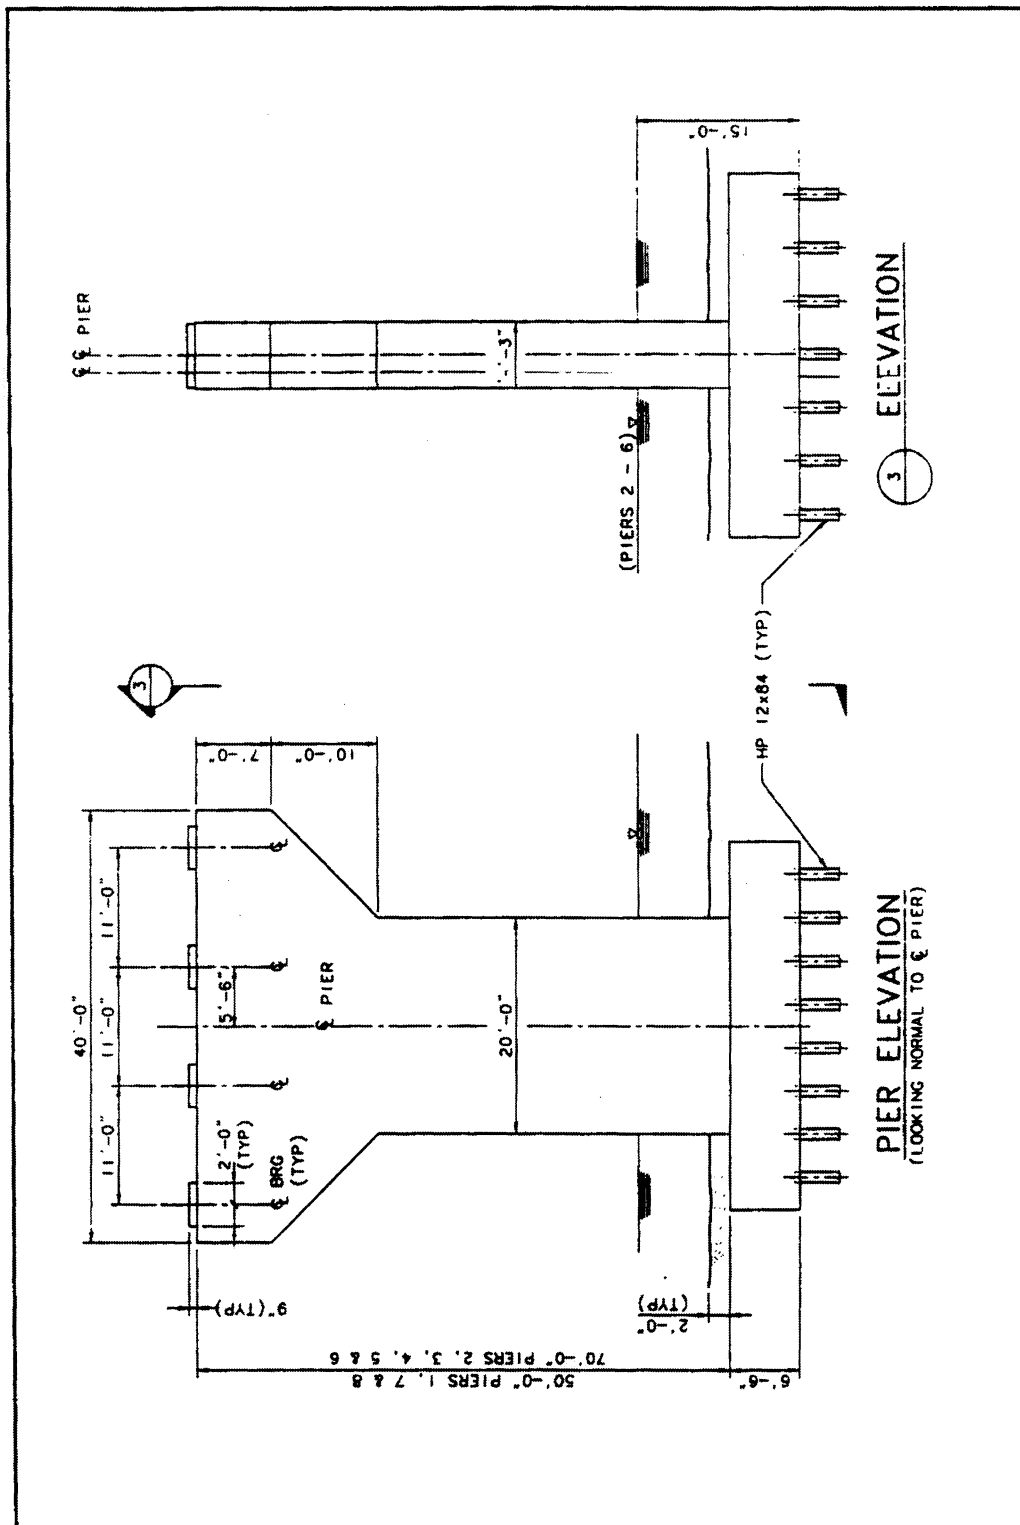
Bridge No. 5 – Intermediate Pier Elevation
